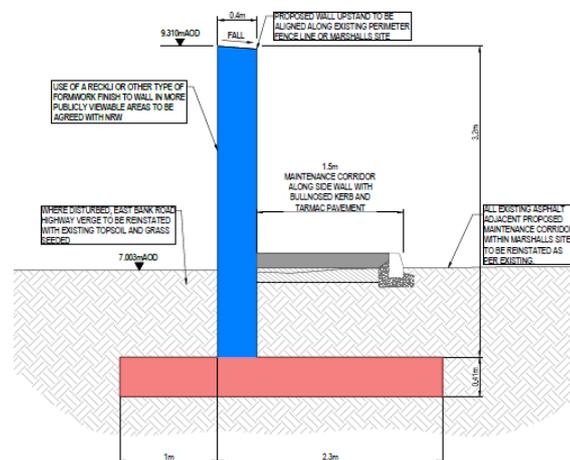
Proposed section of Felnex Reinforced Concrete Flood Wall.
